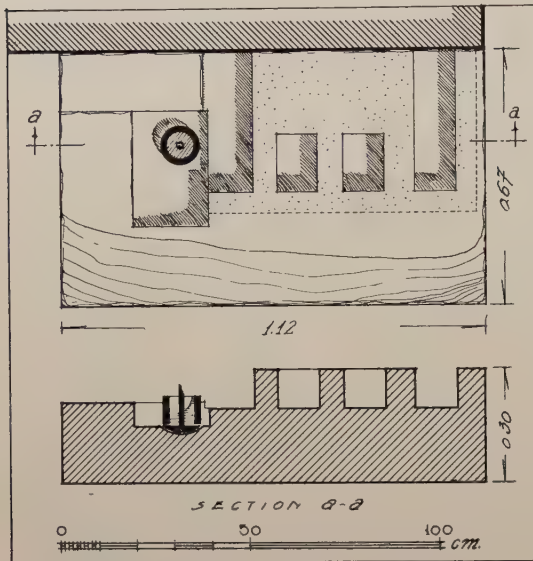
Foundation for Door Jamb of White Poros Gate in the Dipylon, Plan and Section
